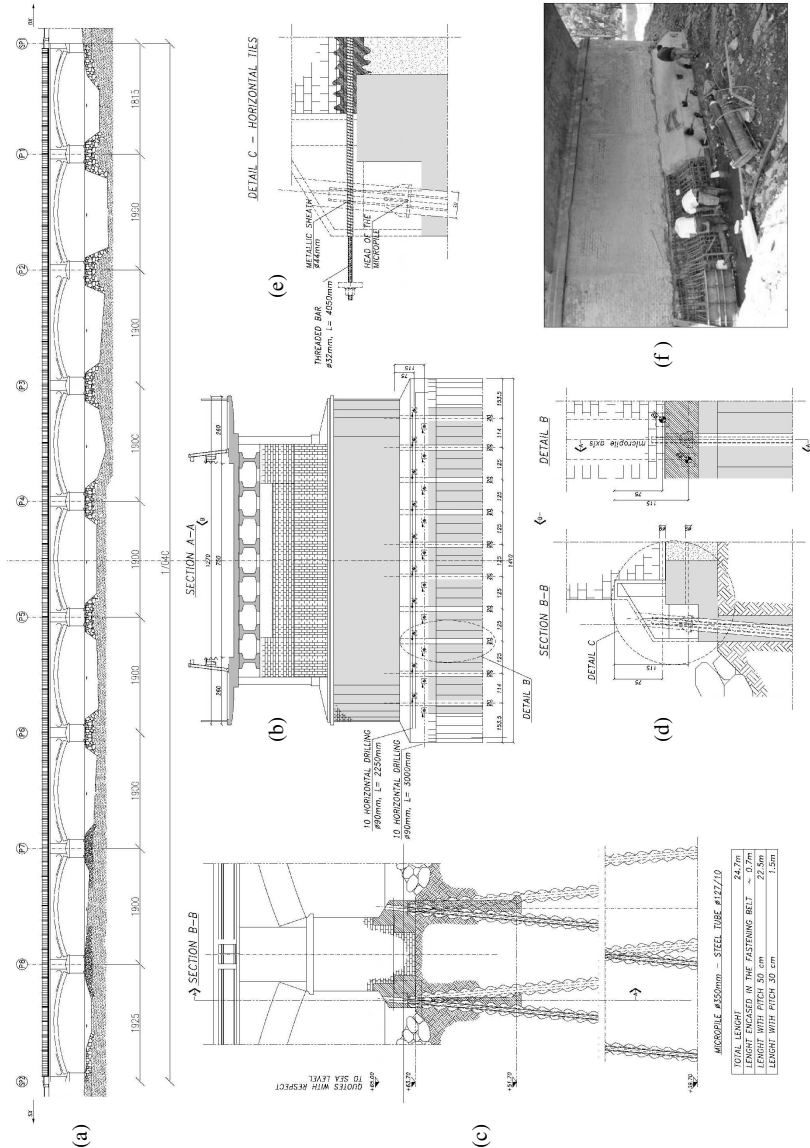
Lodi Bridge (1863-64). (a) front view of the bridge; (b) transversal section showing the new deck, made of precast prestressed beams, the position of the new piles and that of the threaded connecting bars; (c) arrangement of the micropiles at the two sides of a pier; (d), (e) details of the R.C. hooping crown; (f) photograph of an intermediate phase of the works.
